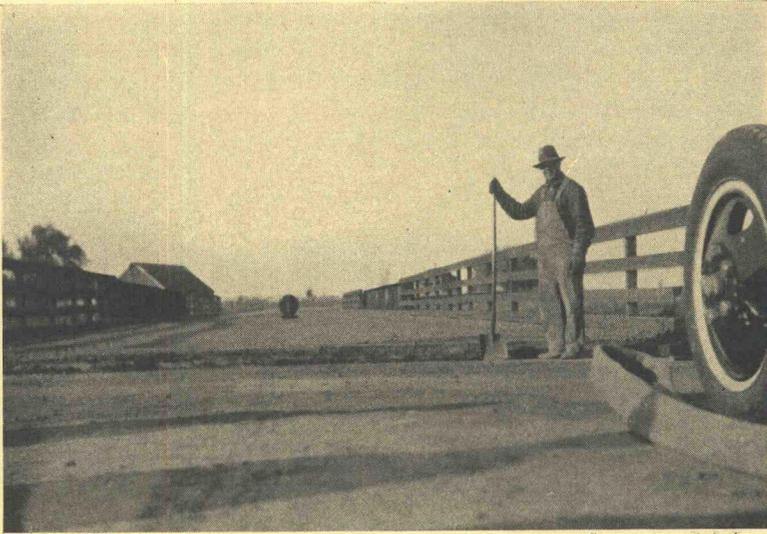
A Pavement Settlement at the Approach to an Overhead Railway Crossing
